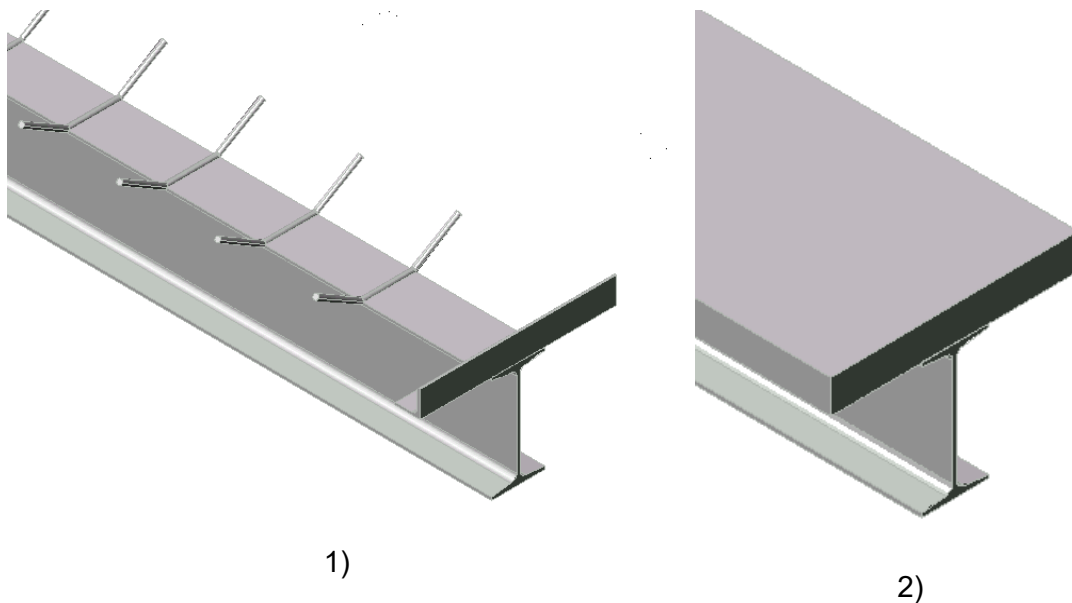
Steel–concrete composite beam structure: 1) configuration of stud connectors and angle stop (before concreting); 2) steel–concrete composite beam structure (after concreting).
